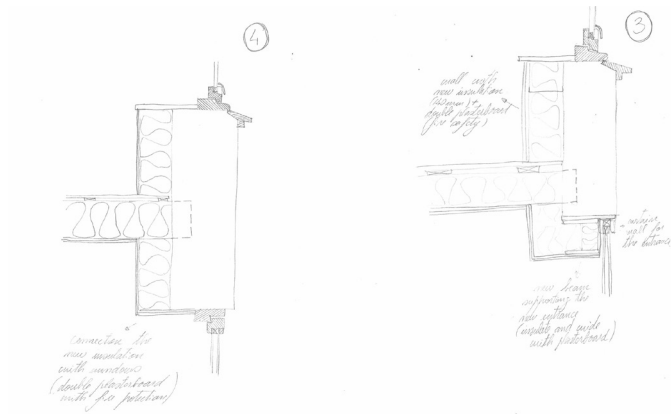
Sketches: Connection of brick wall with the window and the new insulation
